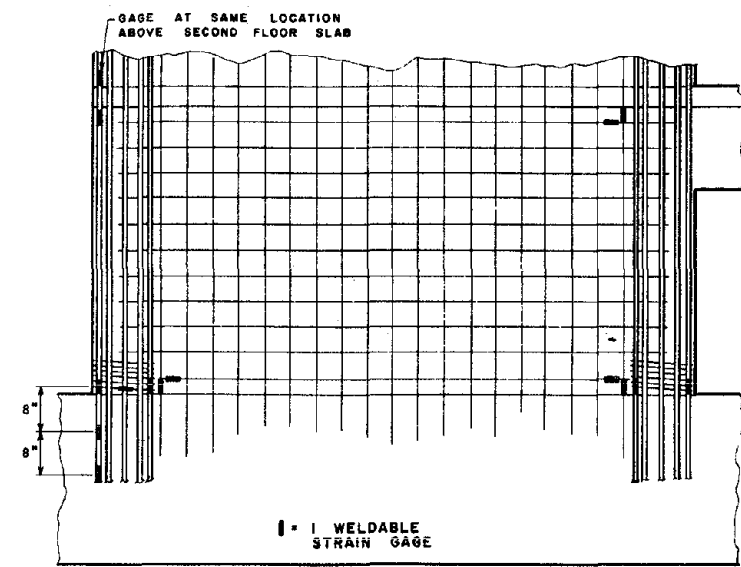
INTERNAL INSTRUMENTATION OF THE WALL PANELS AND EDGE COLUMNS
